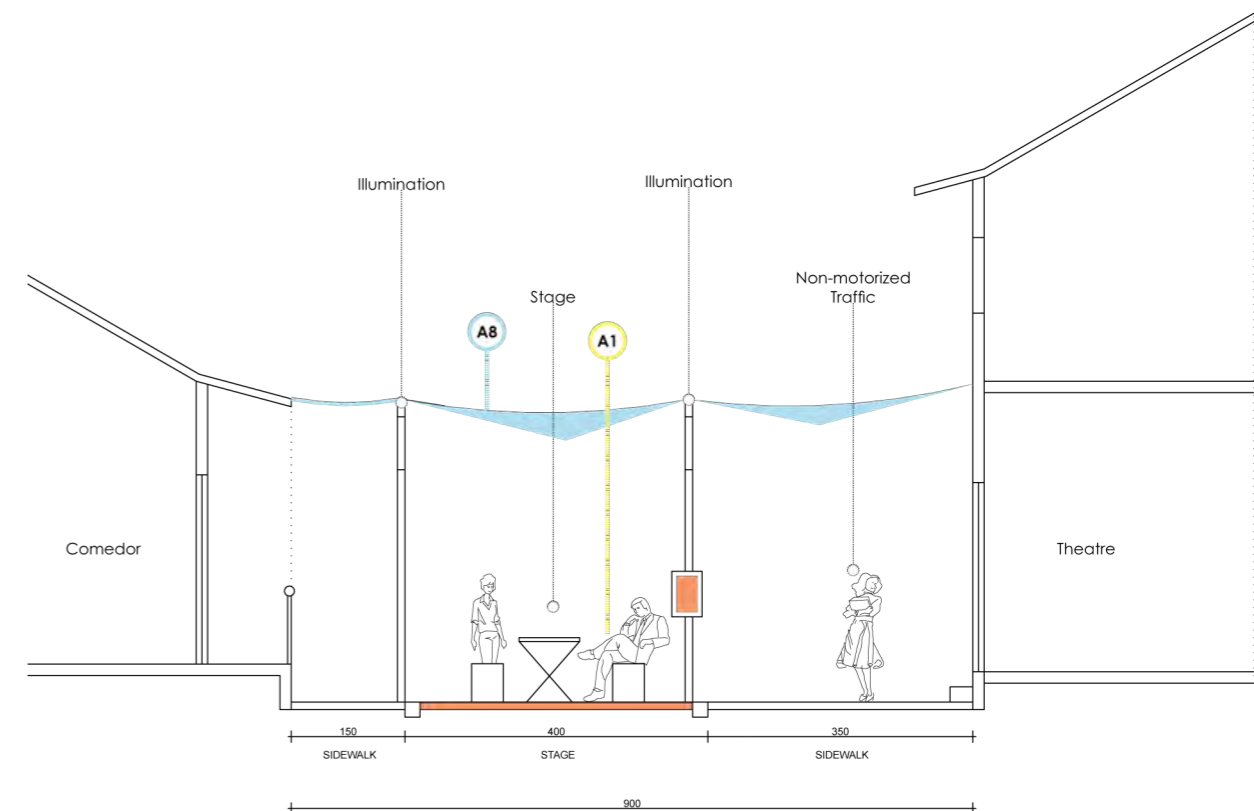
(next page): Street section of a prototypical Common Street. Example: C/ Benito Monción.
